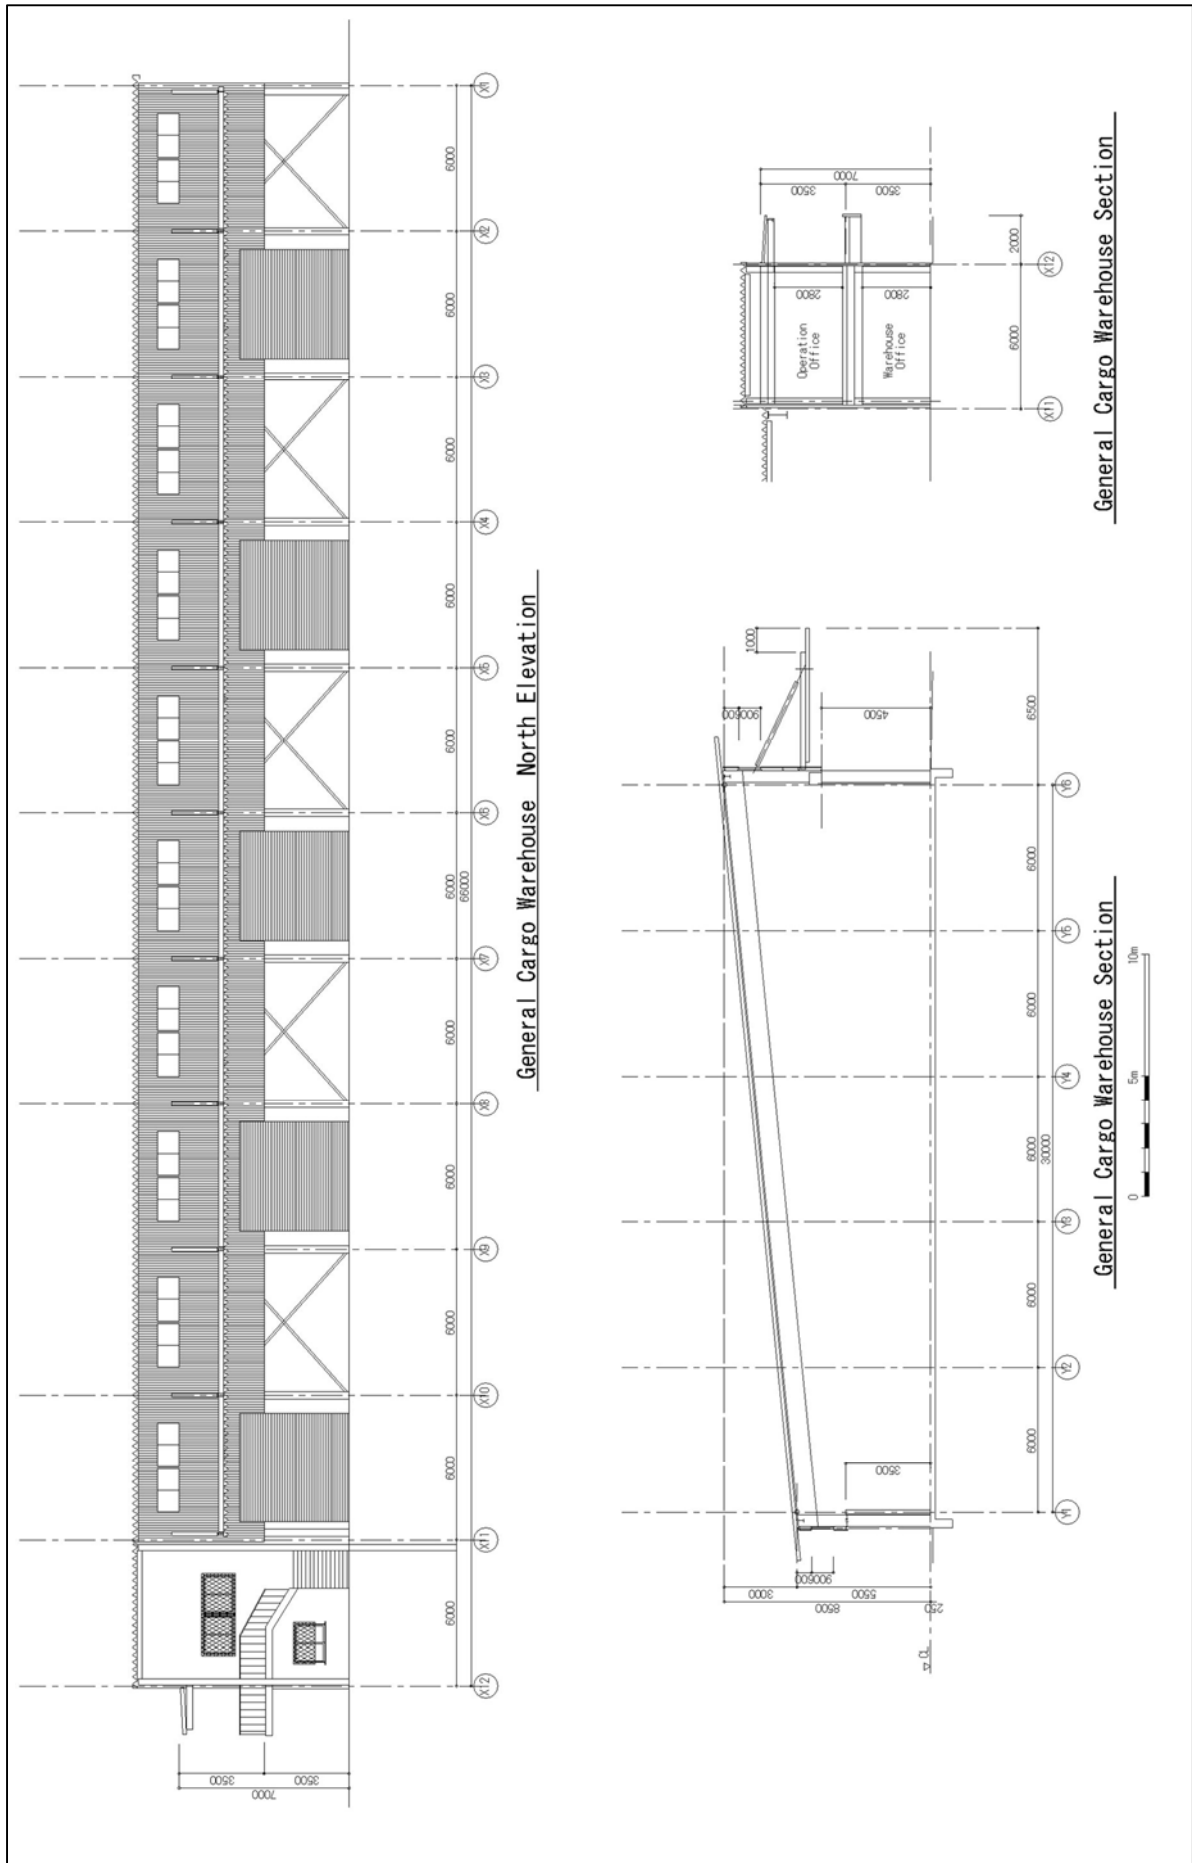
Elevation and Cross Section Plan of (New) General Cargo Warehouse
